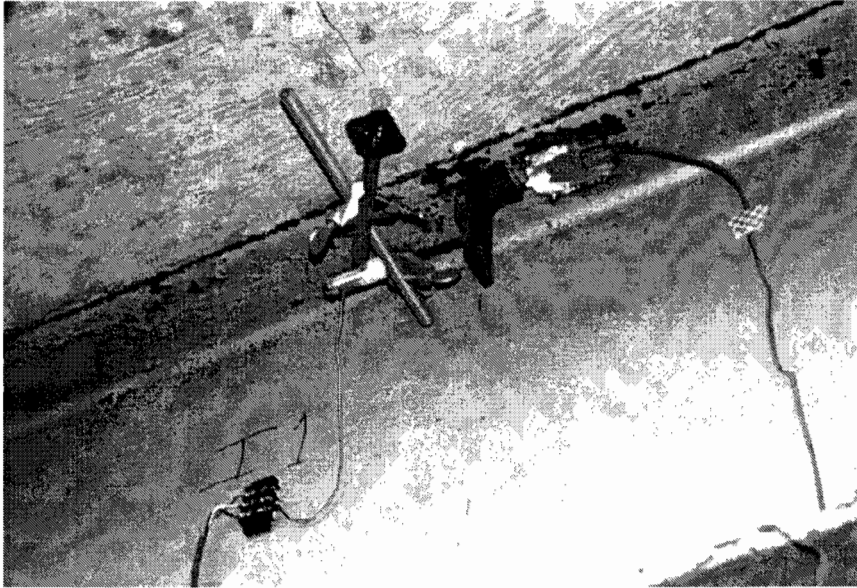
Mounting Assembly for Typical Slip Transducer.
